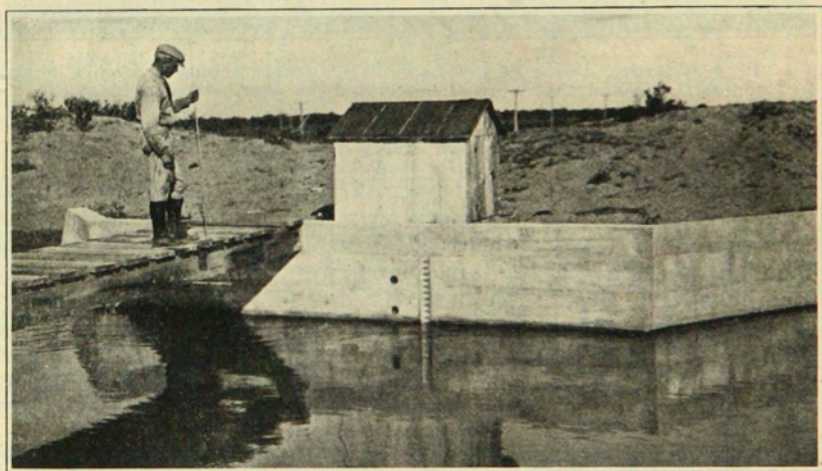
View of concrete flume on Weldon Valley Canal showing instrument shelter and 3-inch tubes through wall into float well.
